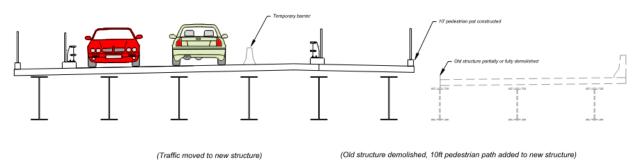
Two Lane Bridge Typical Section with Phased Construction (Four Lane Similar)
